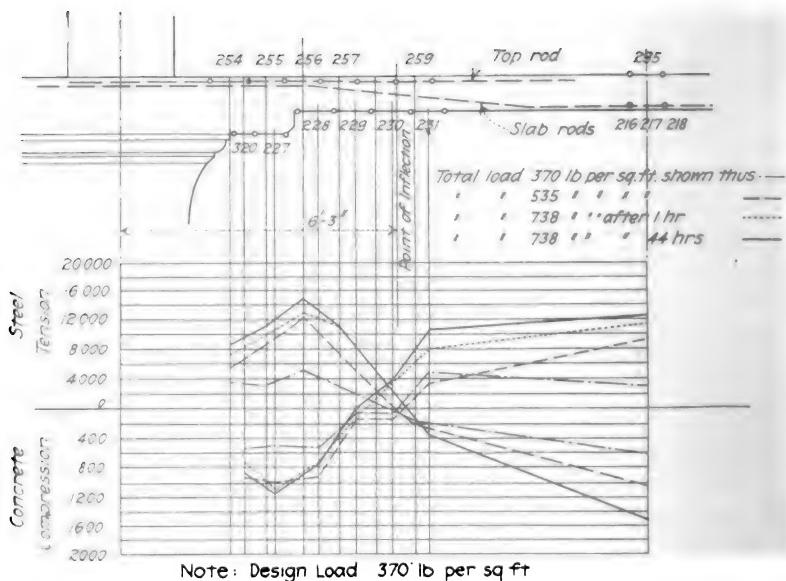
Point of inflection readings in long cross direction of wall panel.
